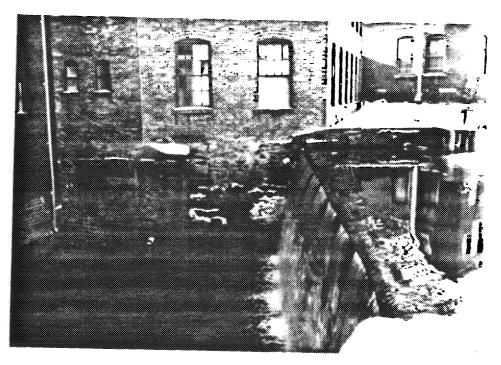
View across spillway. Note inoperative outlet works on right. Note seepage through the wall of the building.
